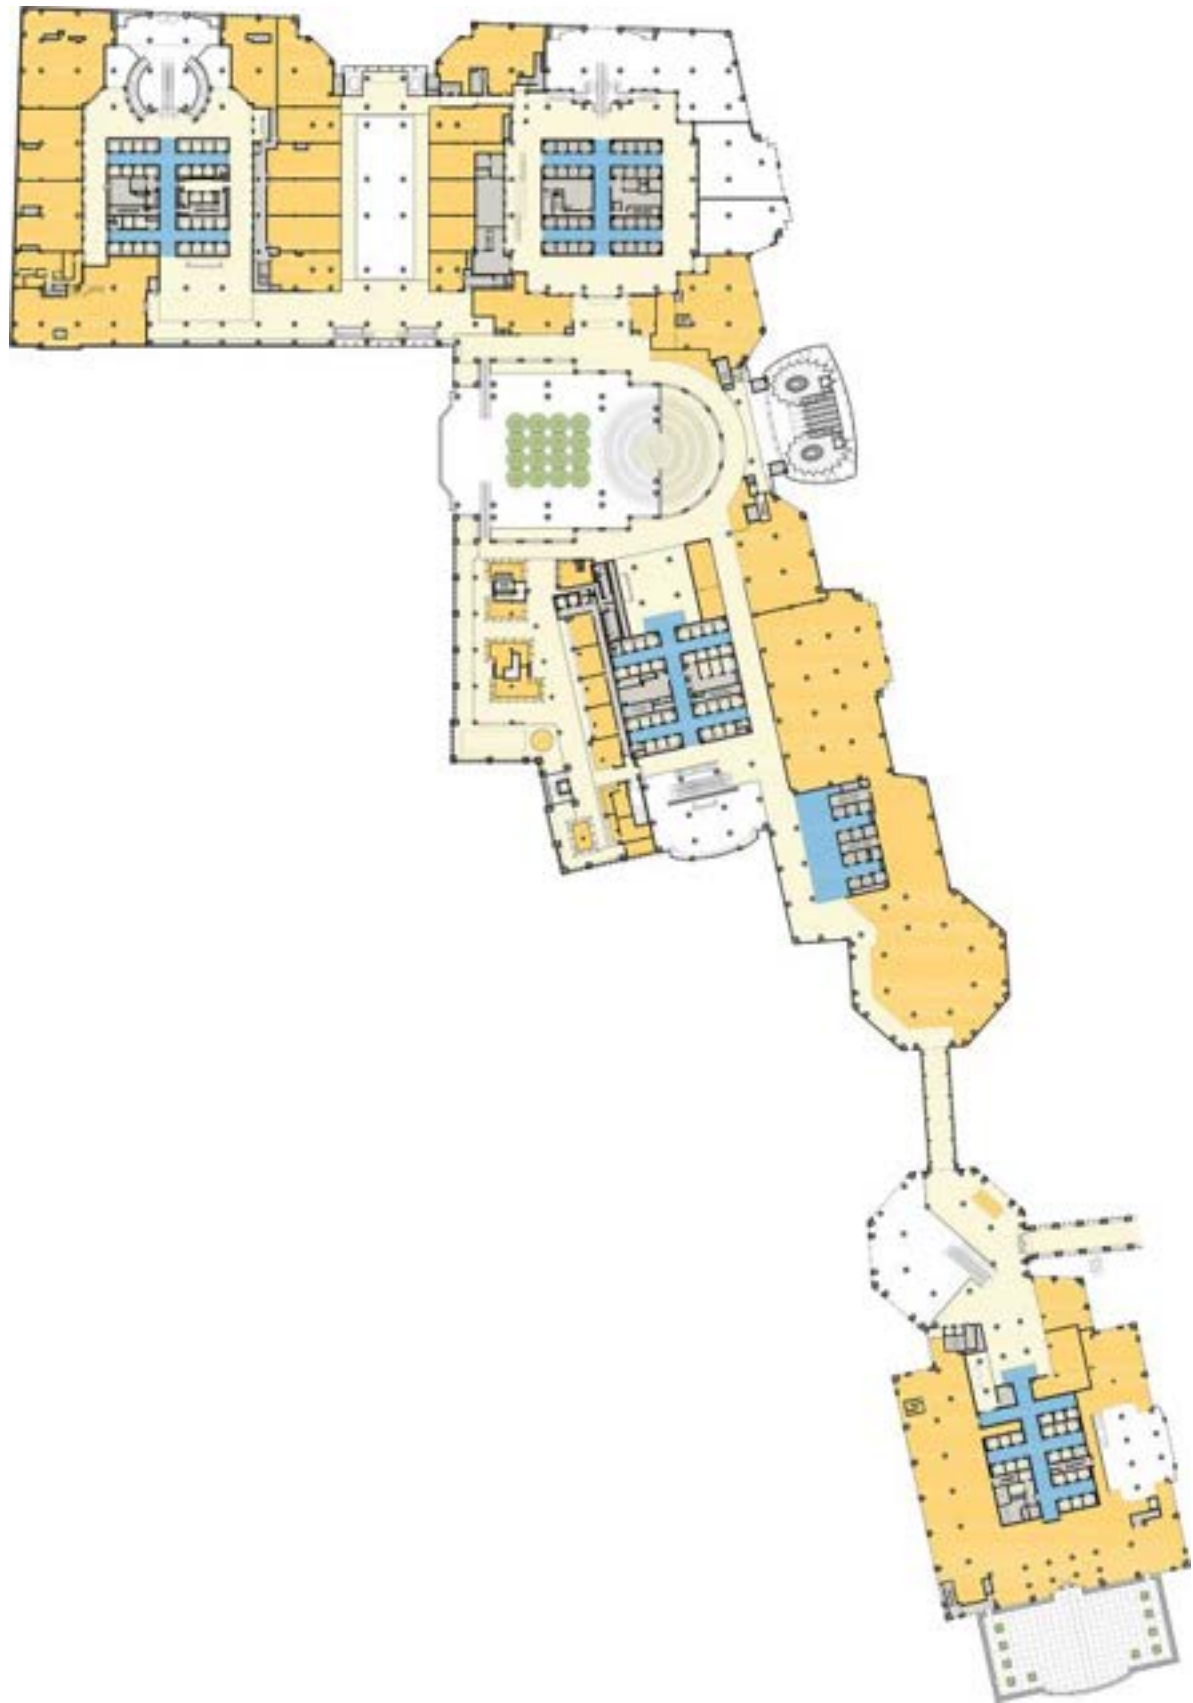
Second Level floor plan of the Brookfield Complex.
